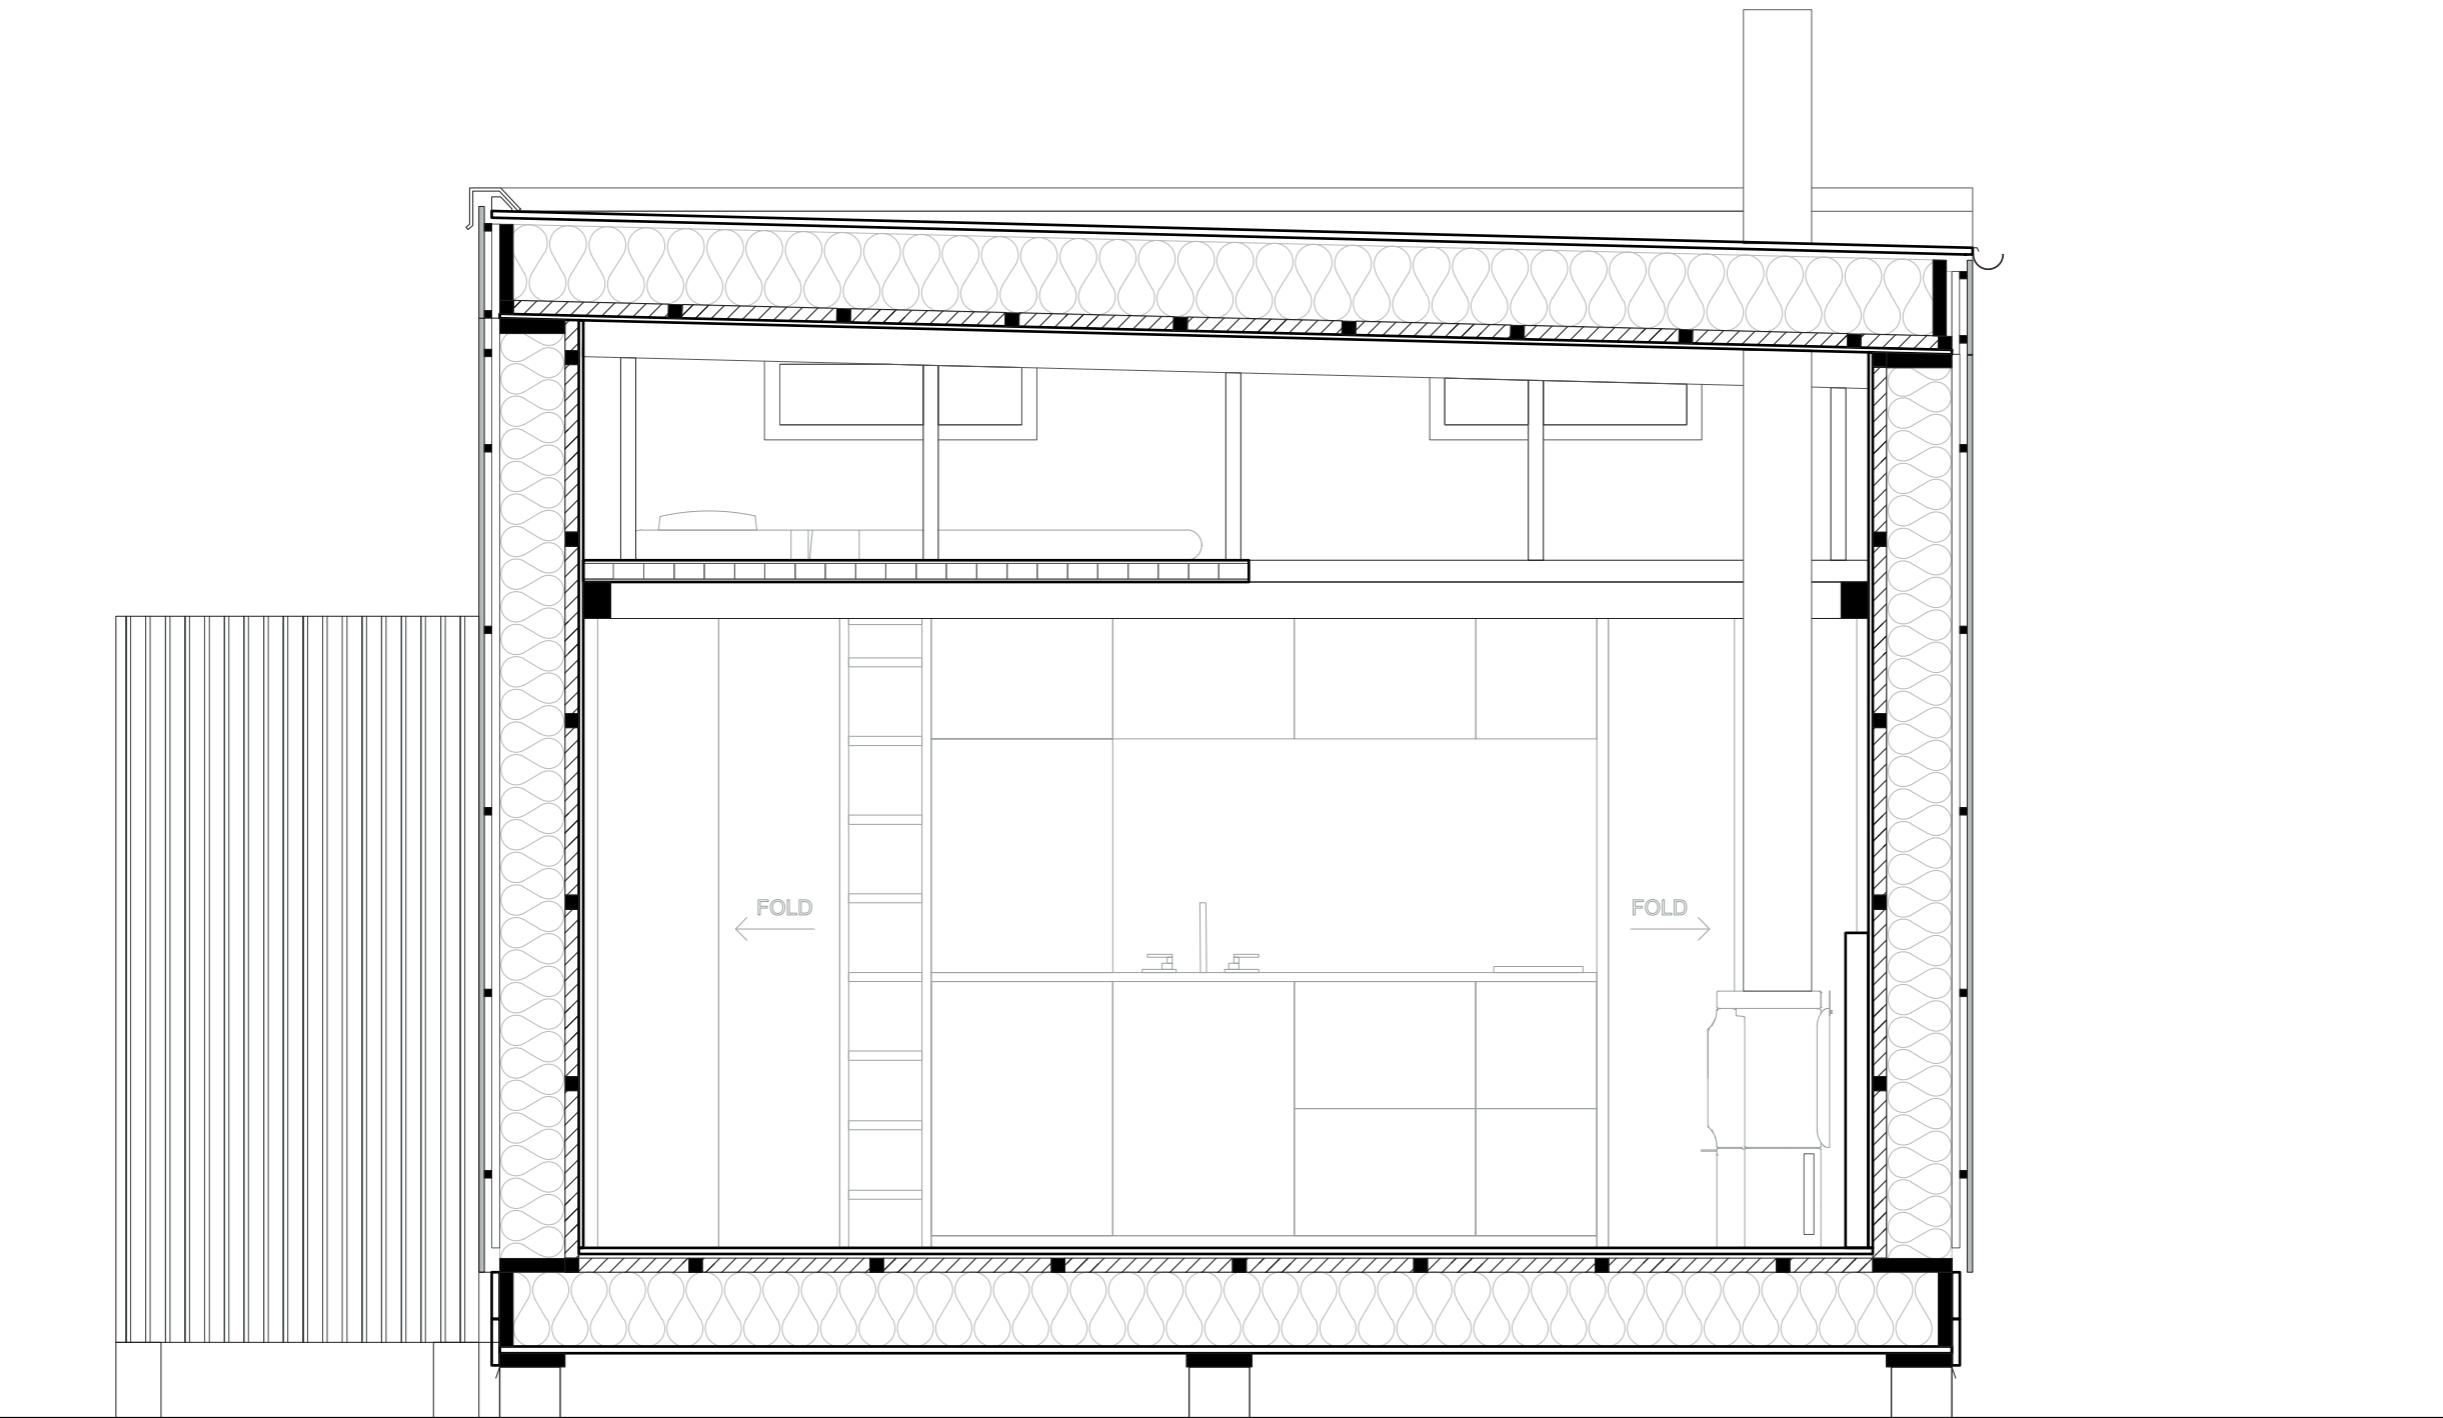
Section A SC 1:25 [AutoCAD and Illustrator]
